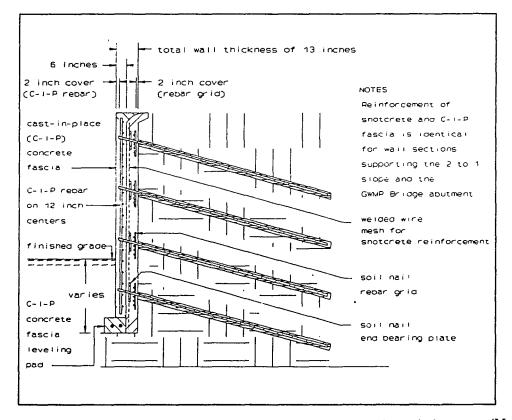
Typical Section showing reinforcement for CIP fascia and shotcrete (Not to scale).
